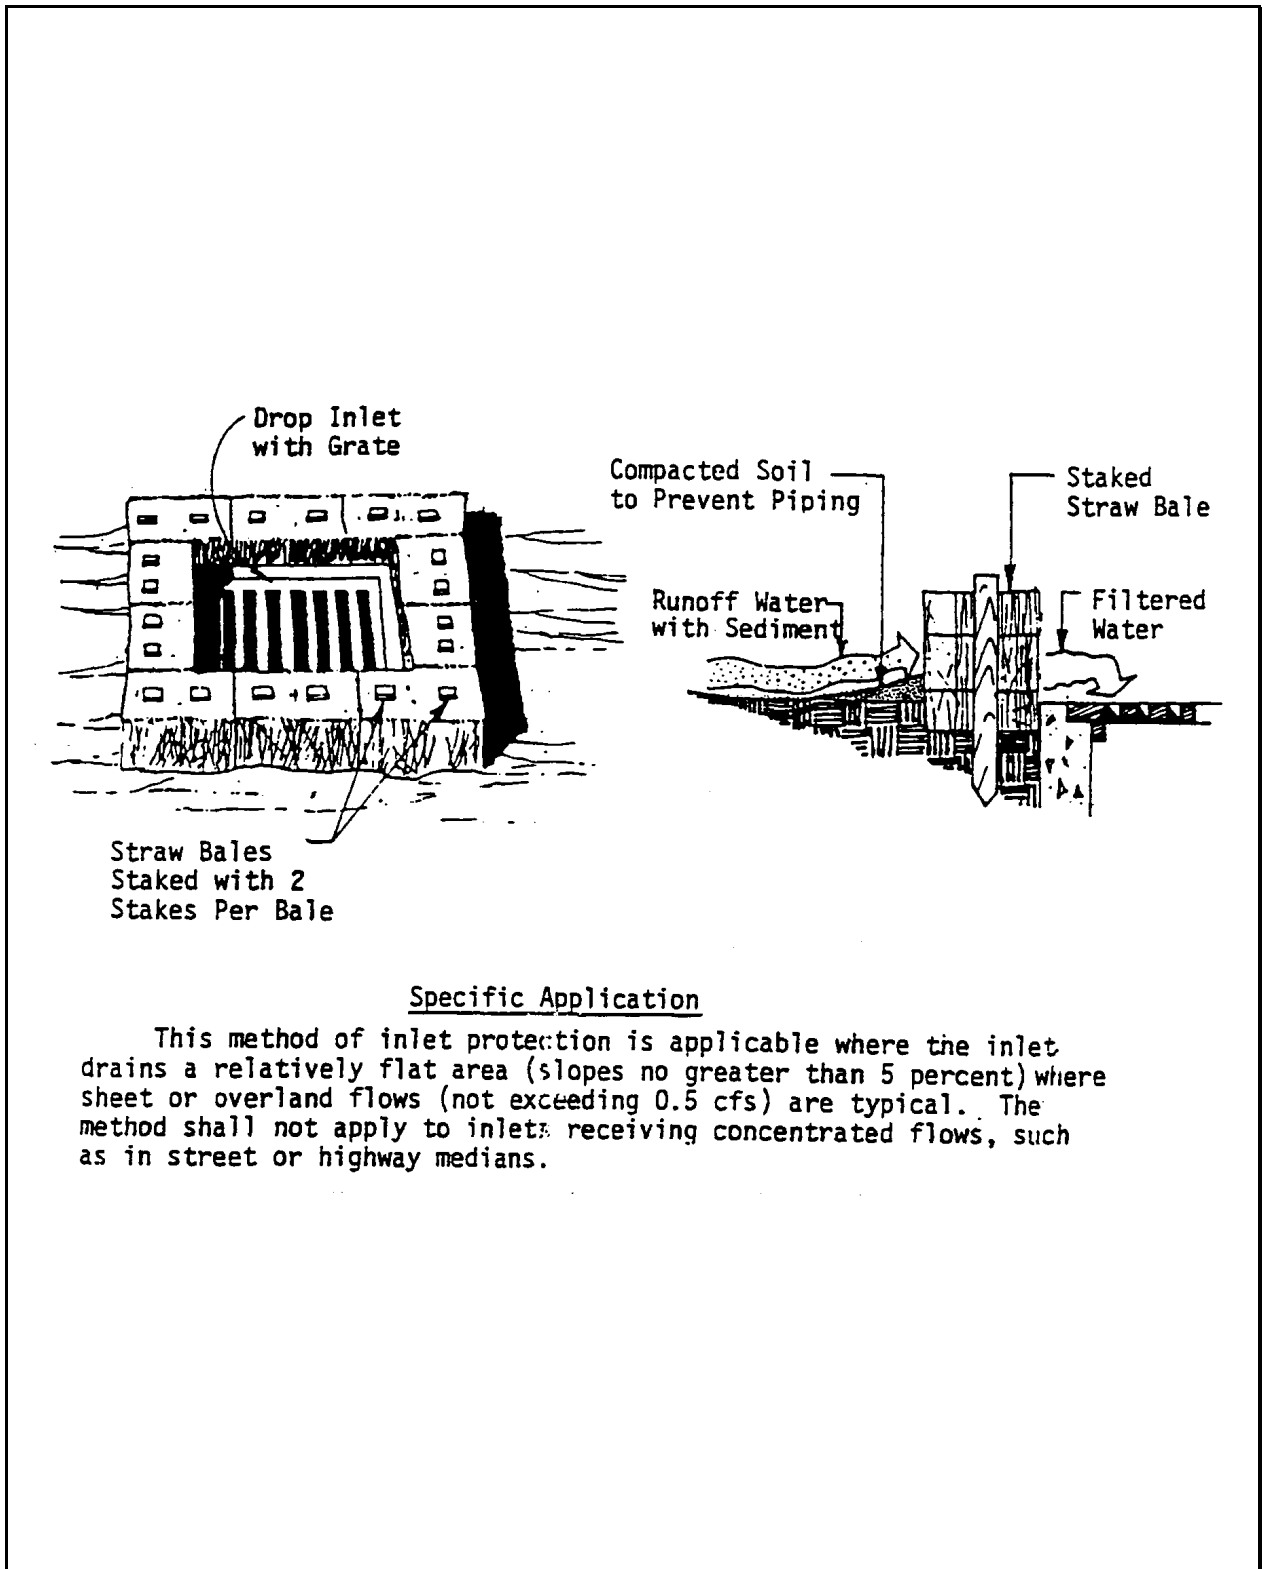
Straw Bale Drop Inlet Sediment Filter
